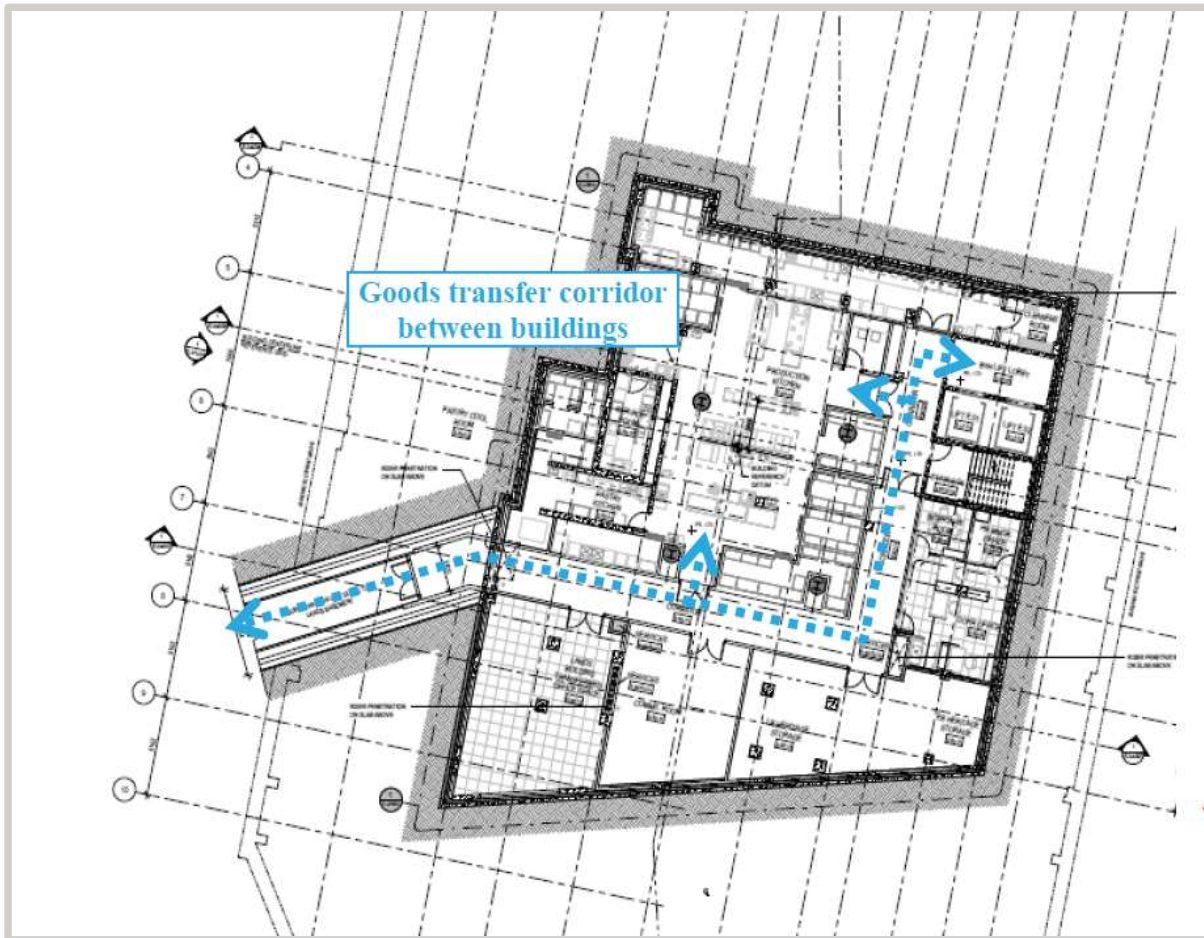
Proposed good transfer link between buildings (Source: Loading Dock Management Plan prepared by Arup)
